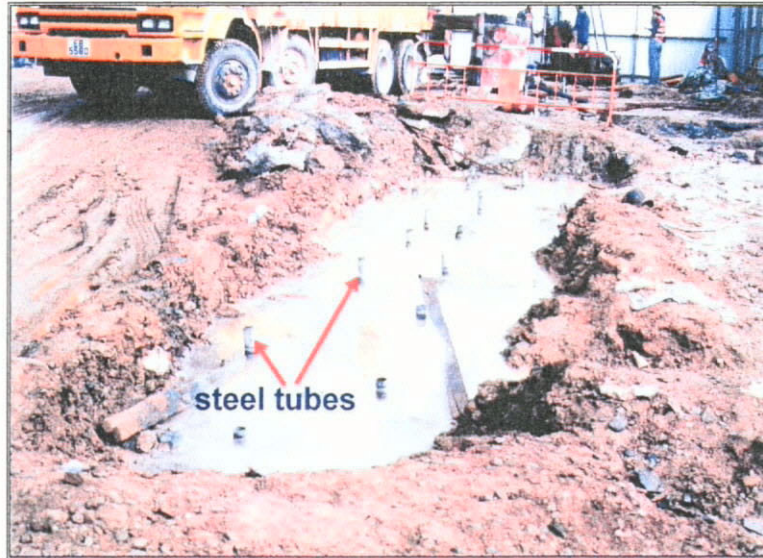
Staggered tube-arrangement in a concrete barrette pile
